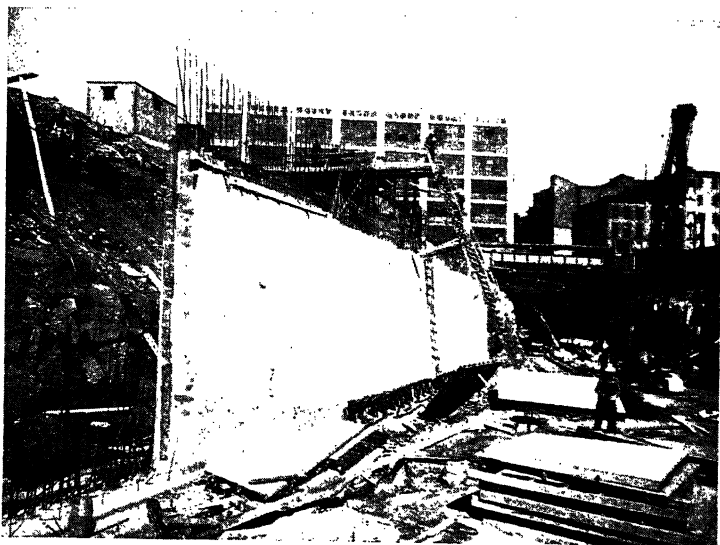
Partially completed retaining wall, Exit Plaza of the Lincoln Tunnel, New York City.
